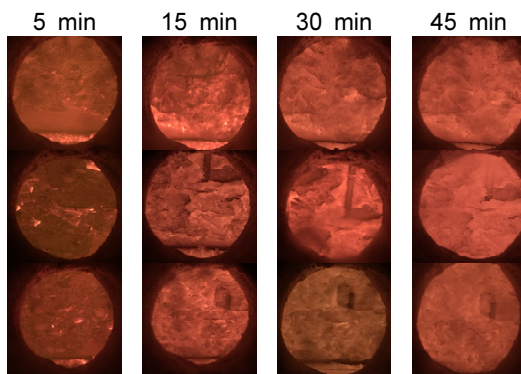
Damaged surface of blast-fire combined tested concrete panels
